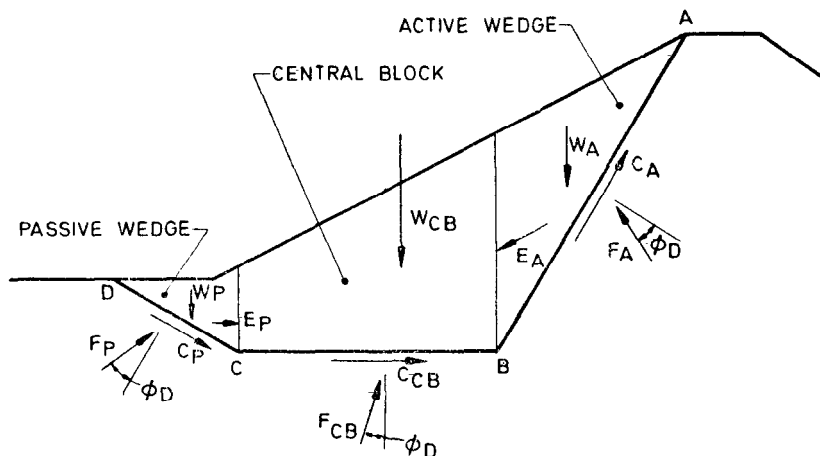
EMBANKMENT SECTION SHOWING WEDGES
